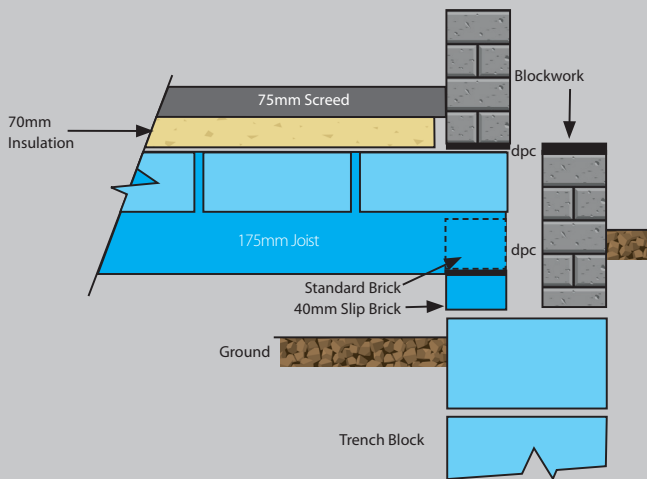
TYPICAL SECTION 175mm DEEP JOIST
